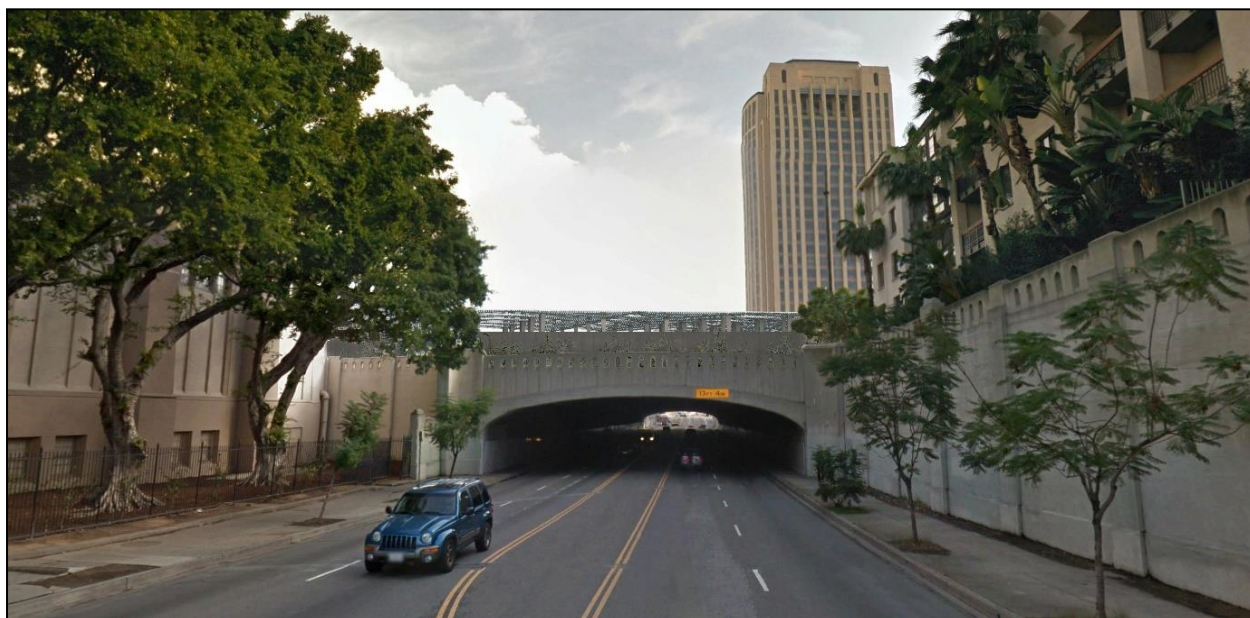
Key View #3b – Cesar Chavez Avenue Bridge (view looking east toward bridge) Post-Project Conditions with New Bridge and Grand Canopy (Design Option 2)
